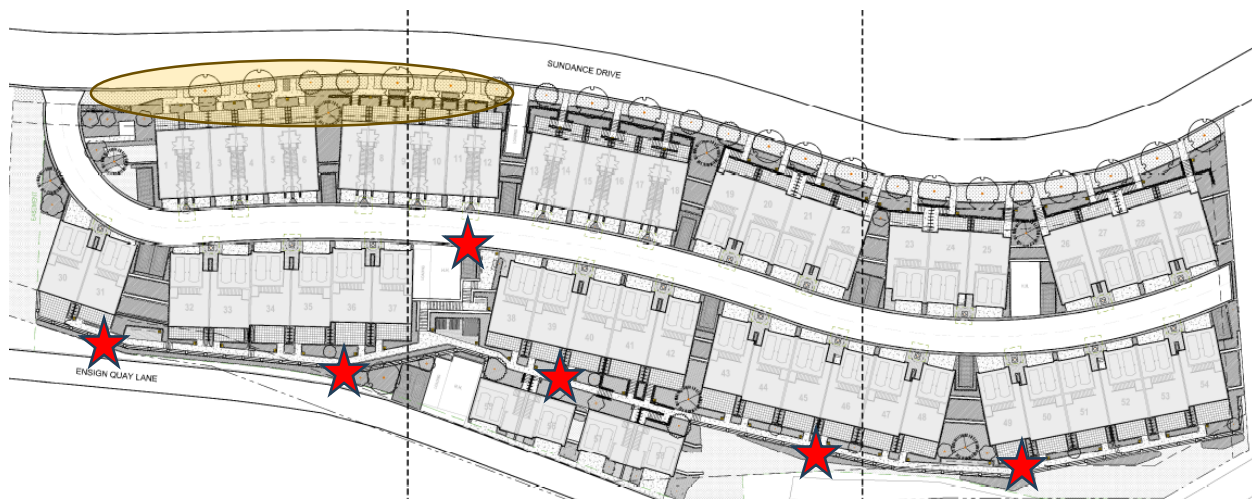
Landscape plan showing pedestrian pathway connection noted with a red star and additional planting and landscaping along the streetscape frontage. Units fronting Sundance are recessed below street level and offer extensive private landscaping.
